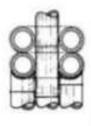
Beam to Beam joint (Hazzard, Hazzard, and Erickson, n.d.)
